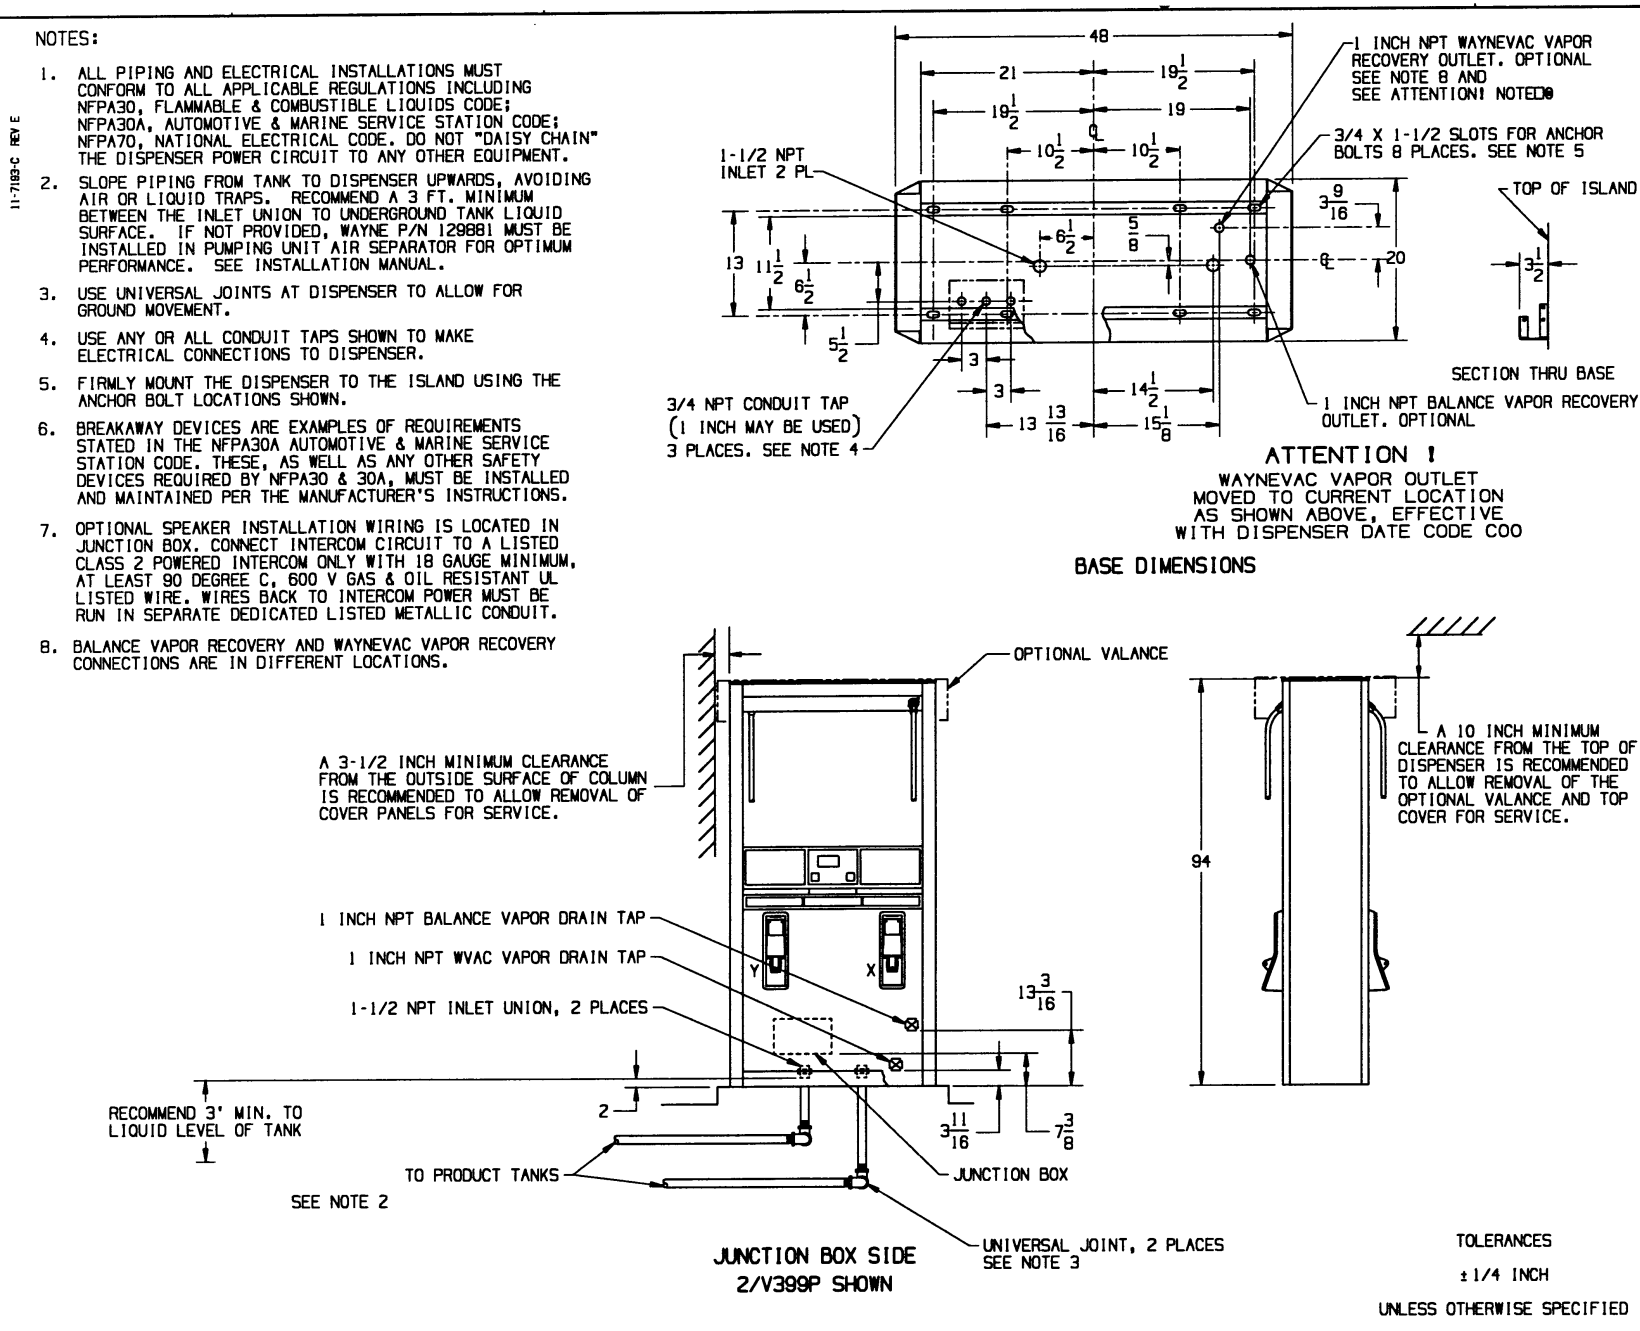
11-7193-C Installation Instructions - 3/V399P (Suction)
